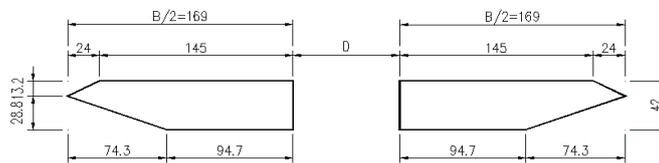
Girder sections of wind tunnel test.(unit:mm)
